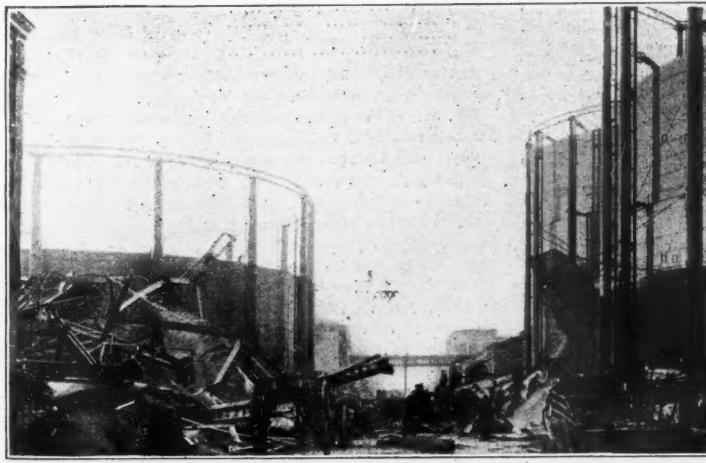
Gas Tank Failure—Looking West on Twenty-first Street.
